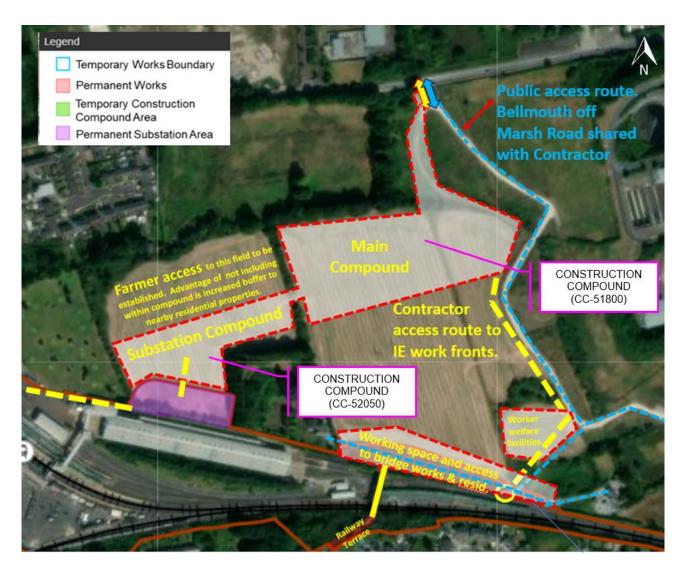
Drogheda Substation - Proposed Construction Compound and Access Routes
